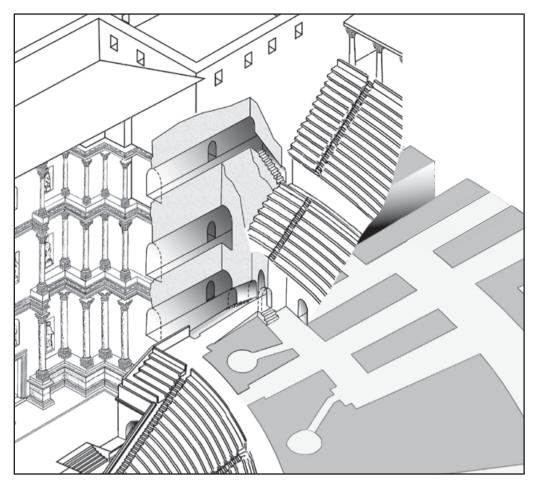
Severan Theater: isometric reconstruction of the media cavea's northeastern corner and its connection to the versura.
